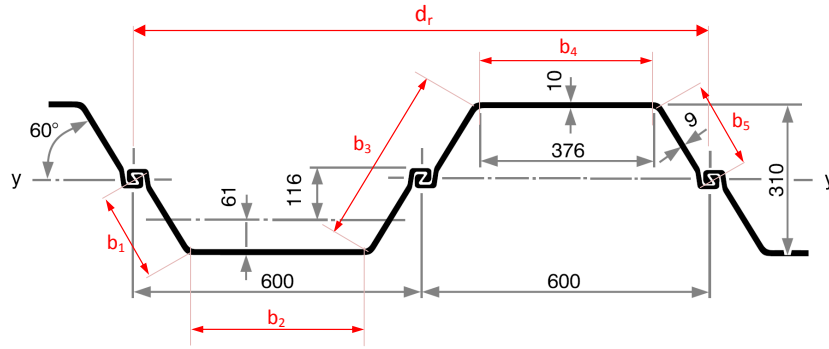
Cross section of the sheet piling wall (VL 603-K profile)
